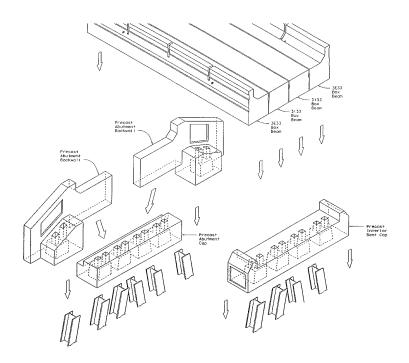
Isometric of Texas Railroad Precast System [1.27]
